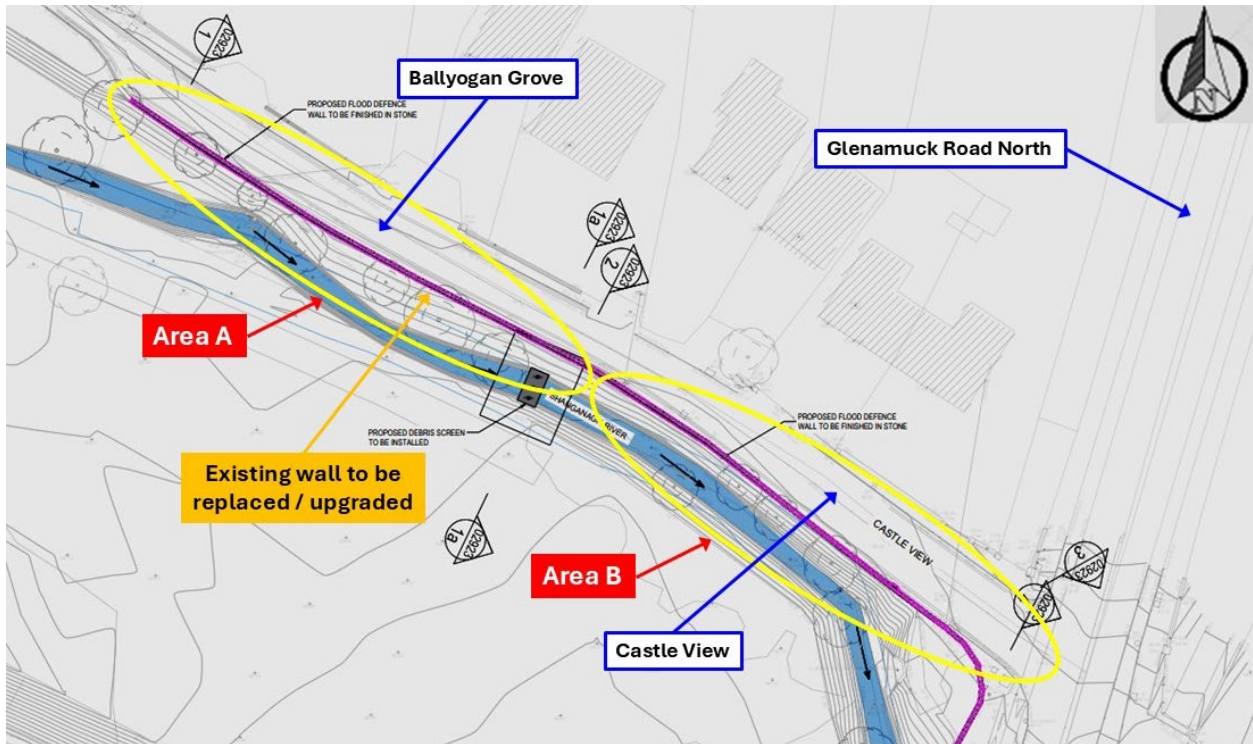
Section of Proposed Works at Glenamuck Road North (Part 1 of 2)
